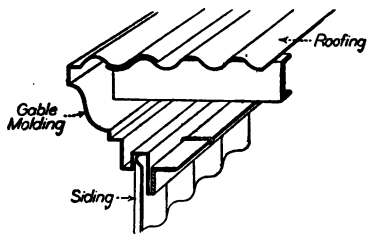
Joining a Gable Molding to Corrugated Roof.
